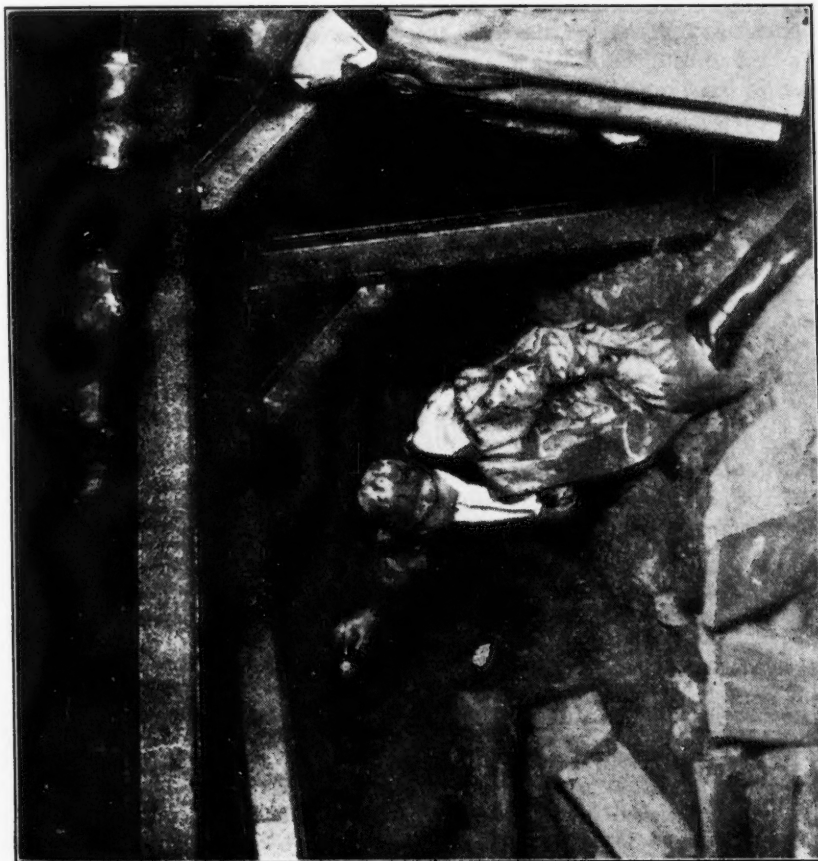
FAULT PLANE THAT APPEARED IN ONE OF THE TANNA DRAINAGE TUNNELS
